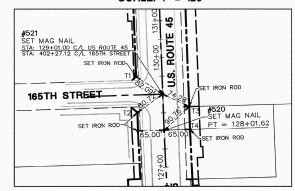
DETAIL OF POINT NO. 518 SCALE: 1" = 120'
